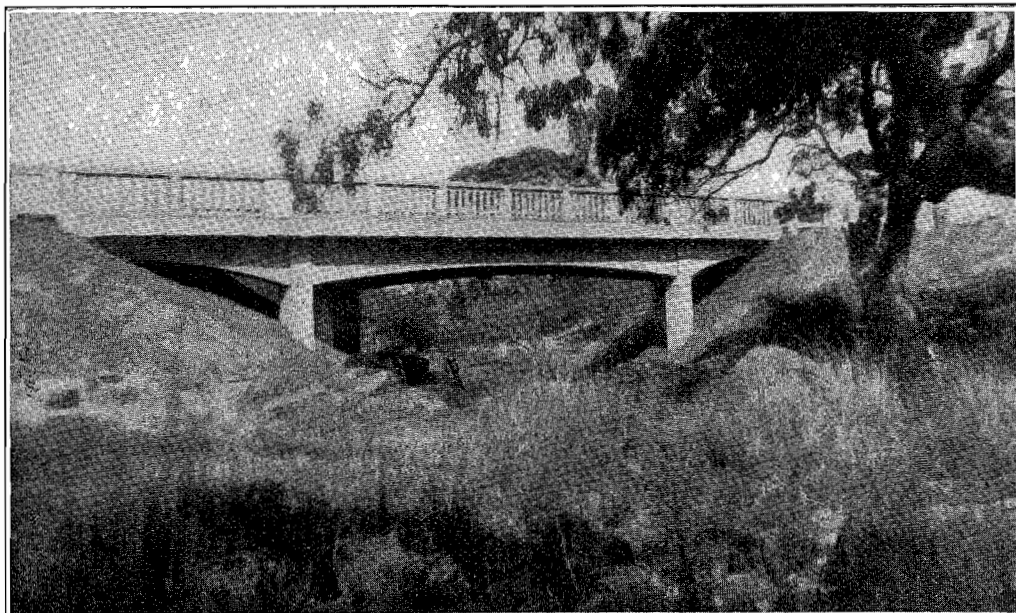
Little River bridge, near Ripley, Geelong-Bacchus Marsh Road.
